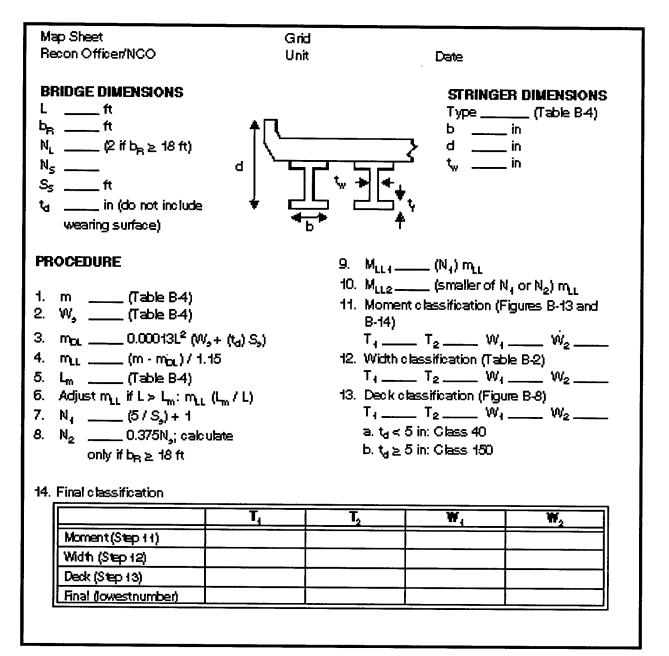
Steel-stringer Bridge With Concrete Deck (Noncomposite Construction)
